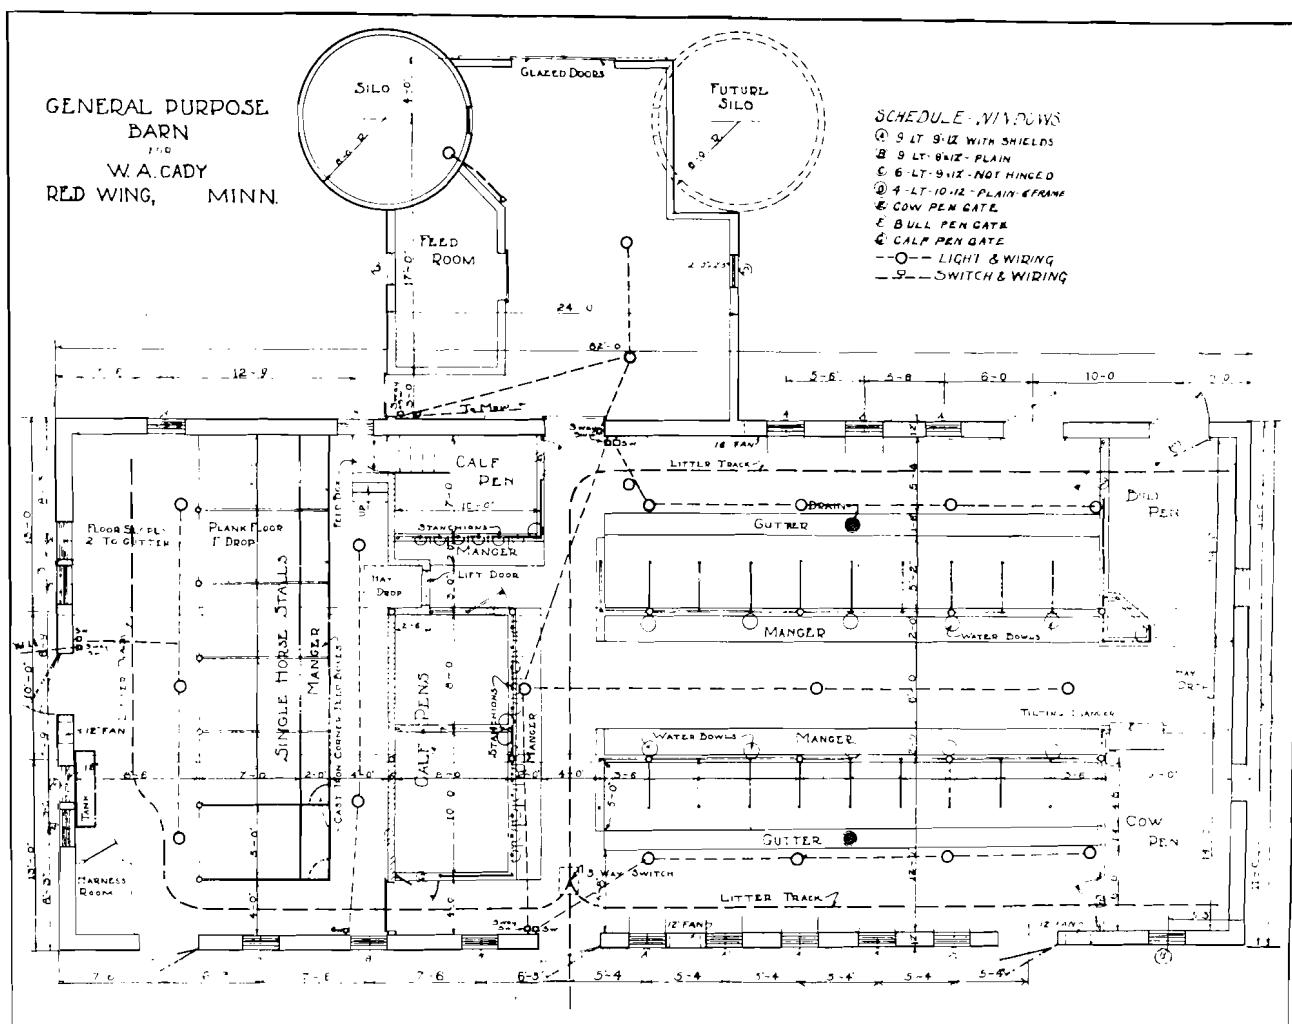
Floor plan of general purpose barn for W. A. Cady. The wiring plans provide for adequate switches.
